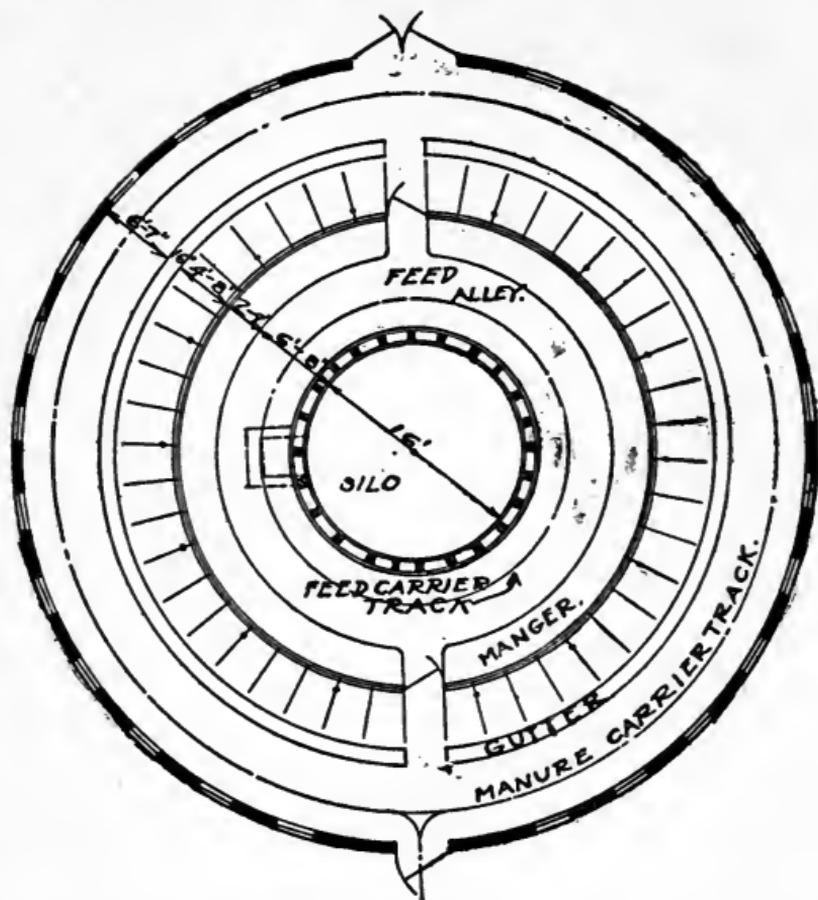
Floor Plan of Round Barn, Showing Silo in the Center and the Feed-Alley Between the Silo and the Manger. A Manure Carrier Track Encircles the Stalls as Shown.
